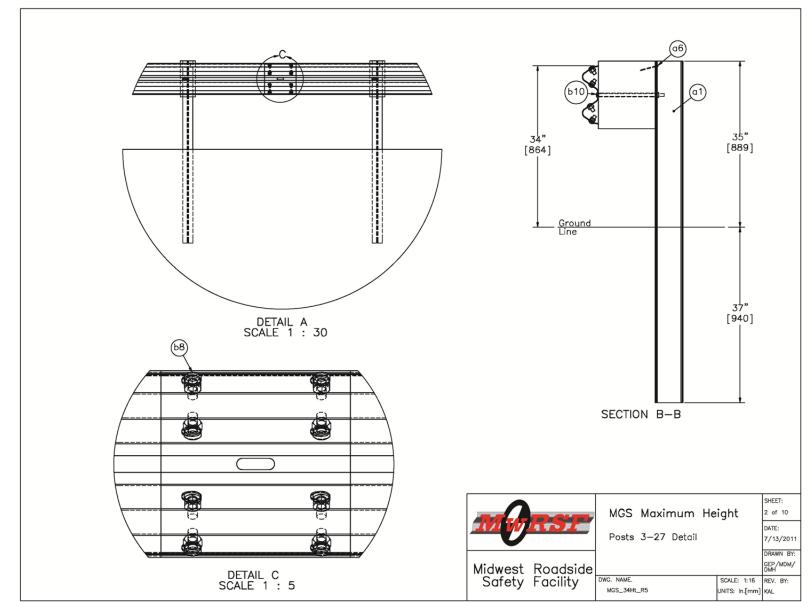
34-in. (864-mm) Tall MGS Details, Test No. MGSMRH-1
